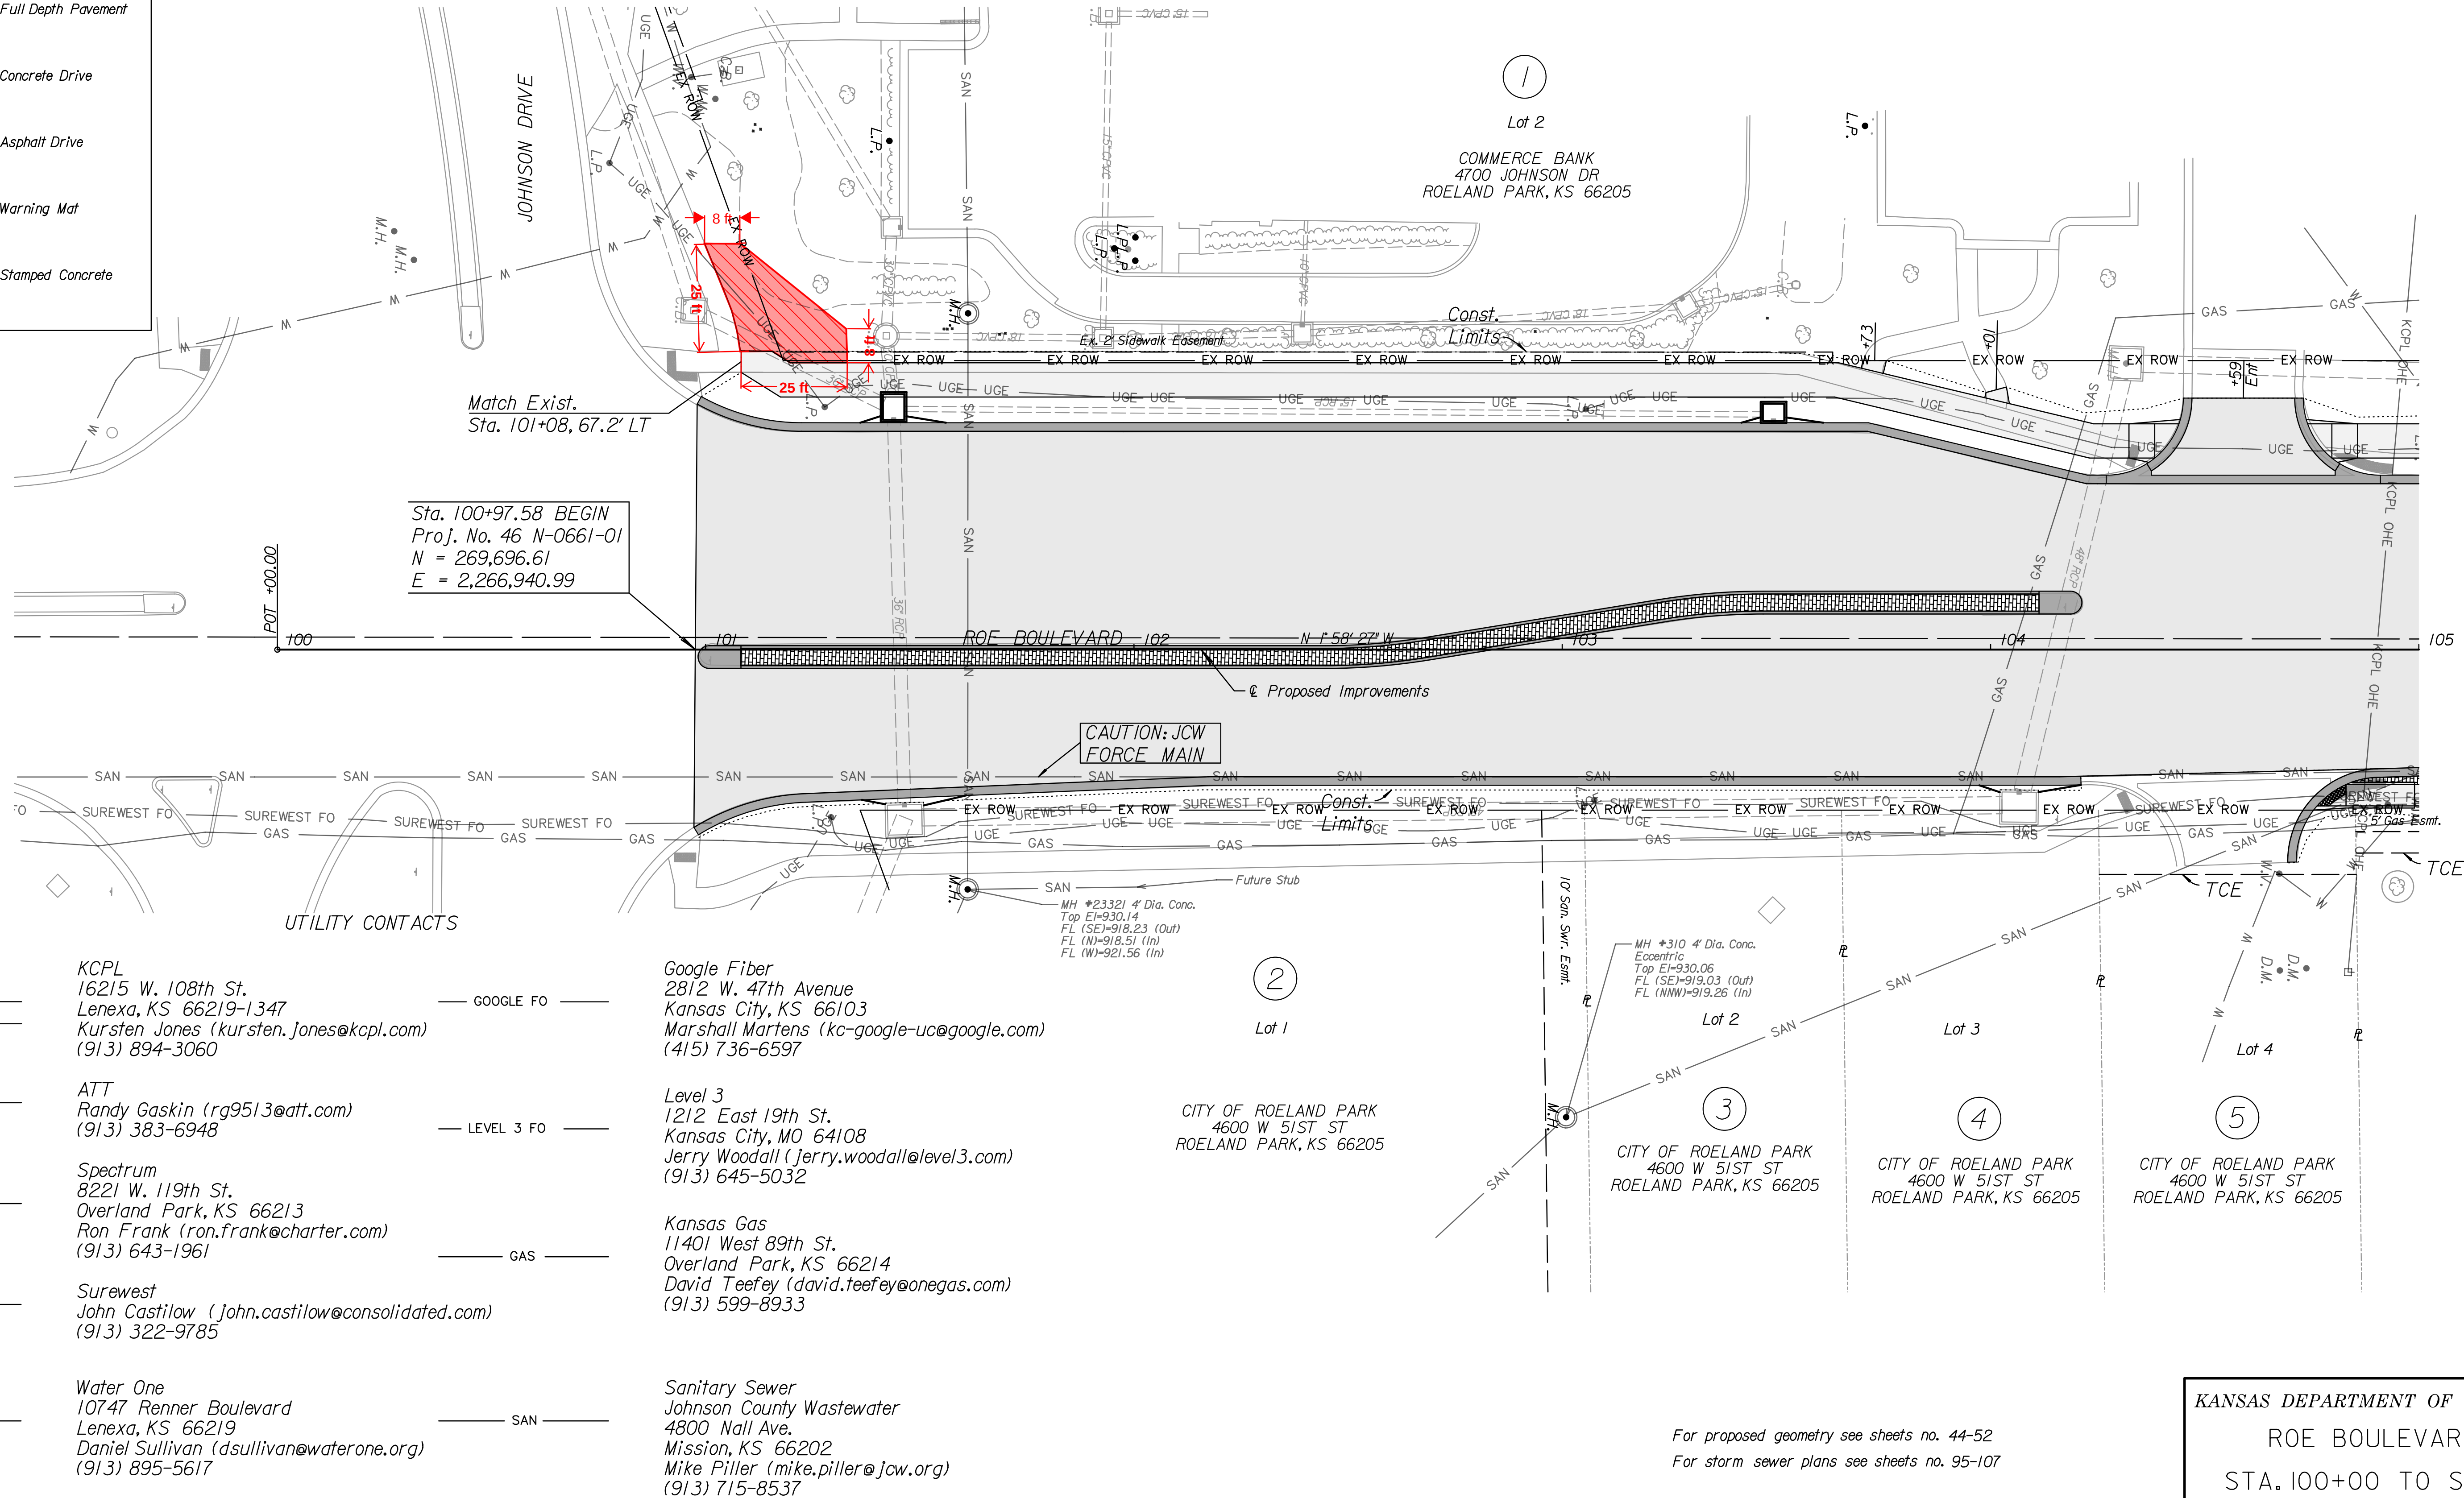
EXHIBIT A | GATEWAY SIGN LOCATION PLAN
